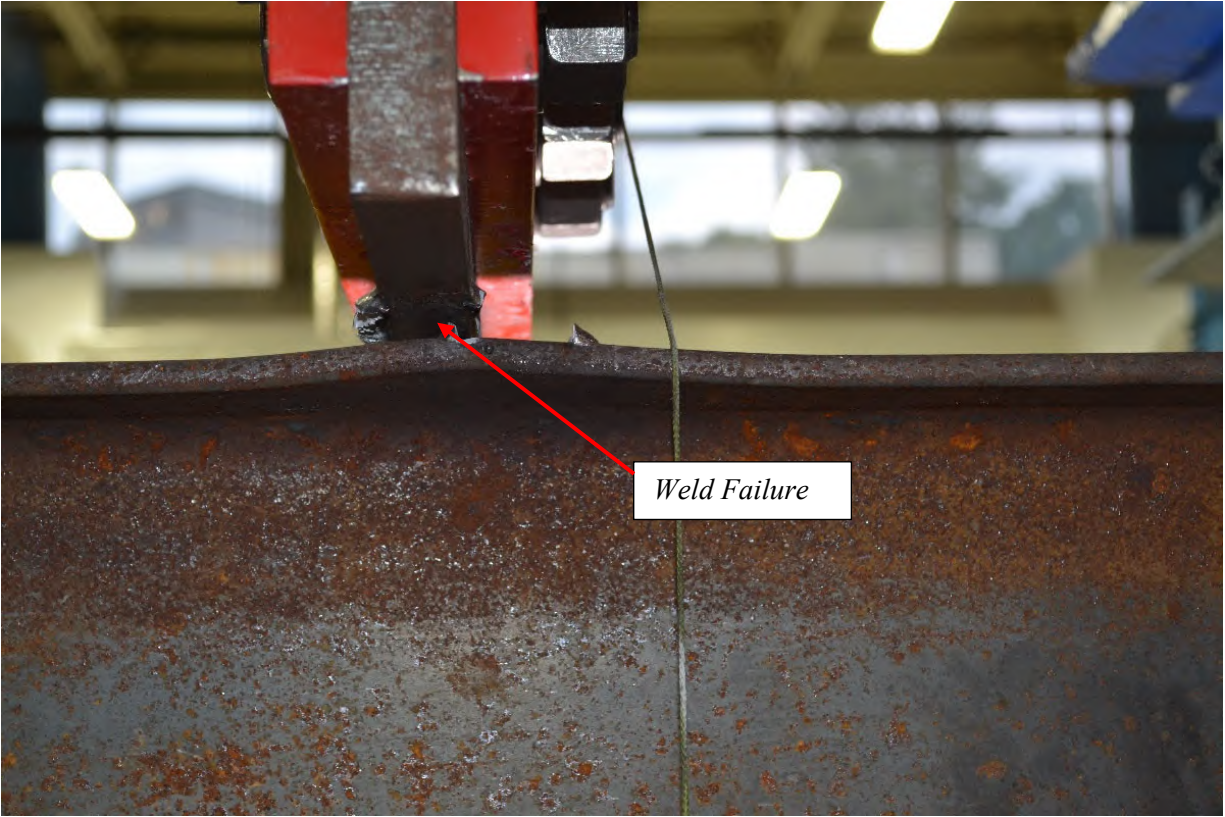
Close-up view of W12X26-DC-E0 after testing
